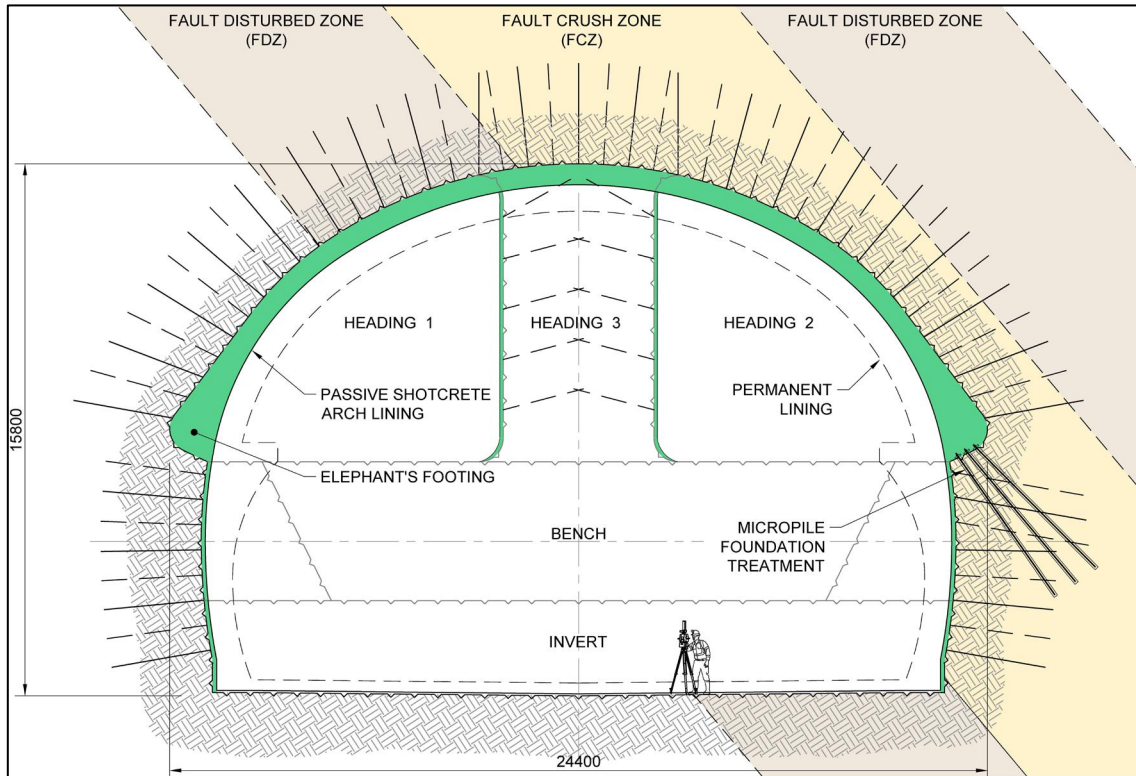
Roma Street Station cavern – showing passive shotcrete arch lining and micropiles at the elephant's footing foundation (Shen et. al. 2022).
